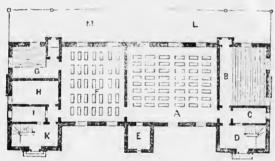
First Floor, (Boys' School) adapted to Fig. 133.
